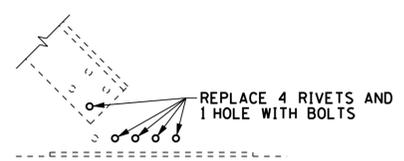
DETAIL "X" - FLOOR BEAM DECK SLAB BRACKET REPAIR
